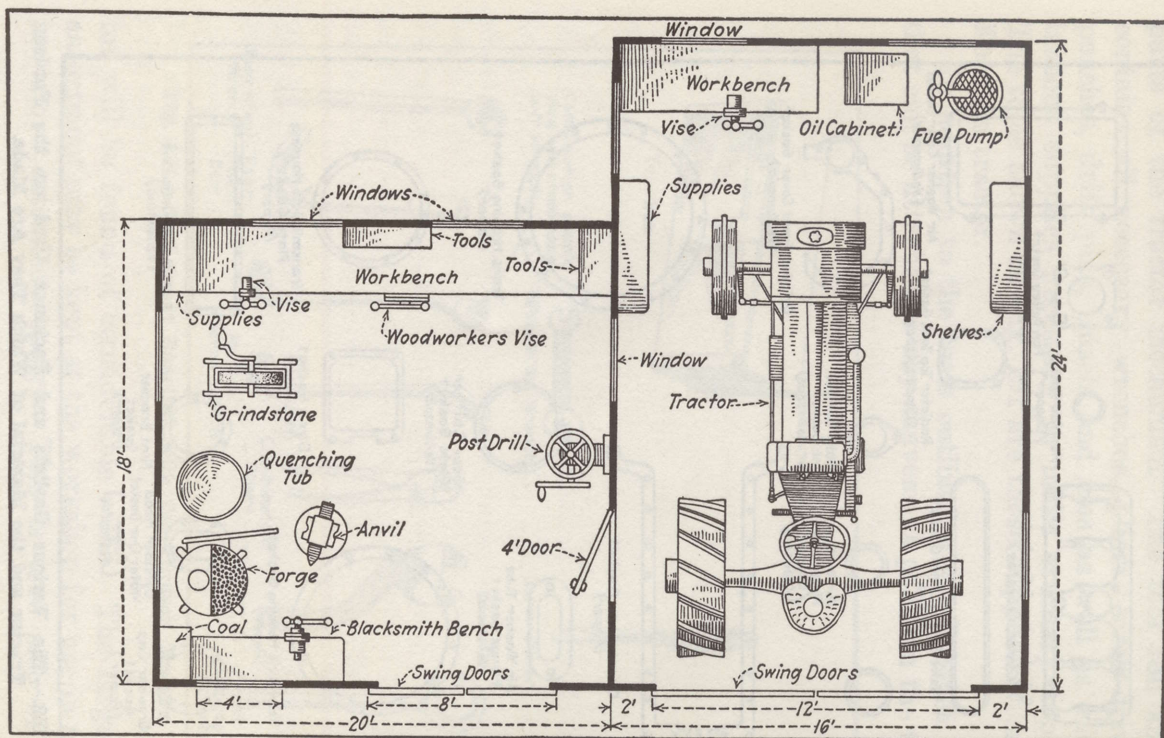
Plan View of Combined Tractor House and Automobile, Carriage and Farm Machinery Repair Shop.
